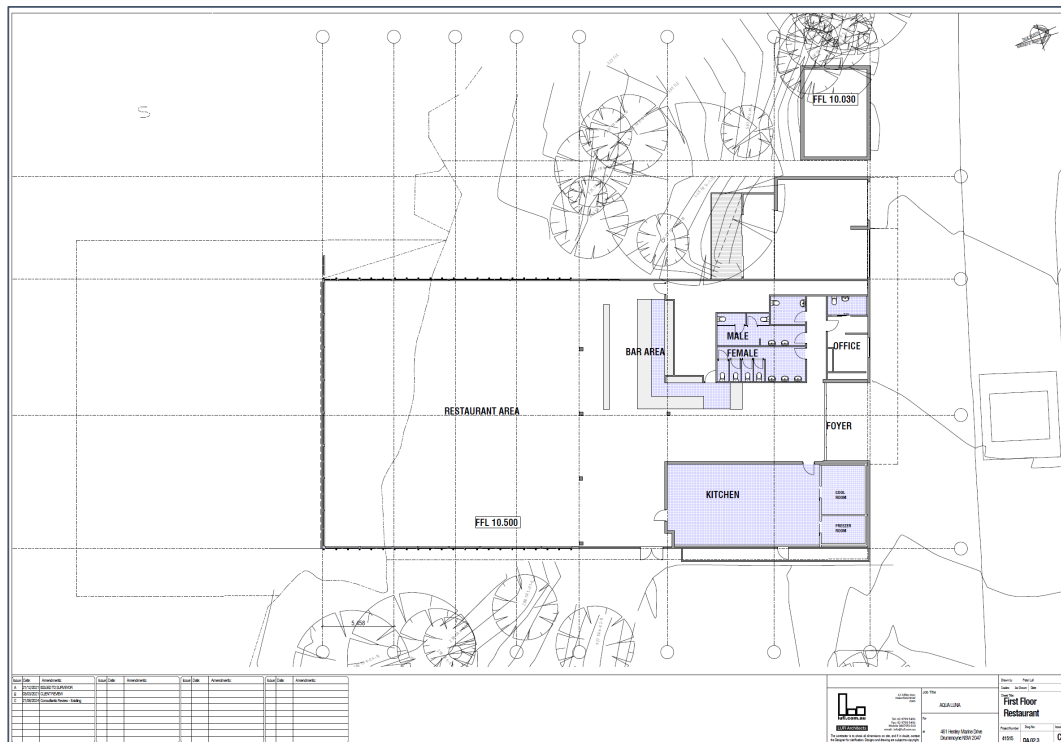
Proposed first floor restaurant (Source: LUFi Architects)
